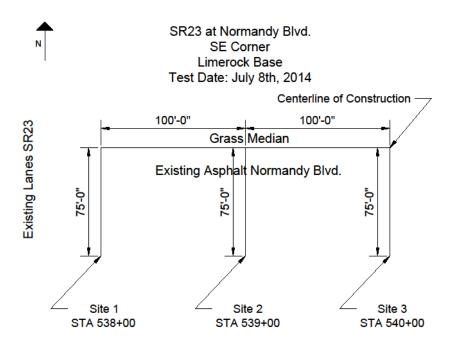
Project Site #5 SR-23 limerock base - Test site location sketch
